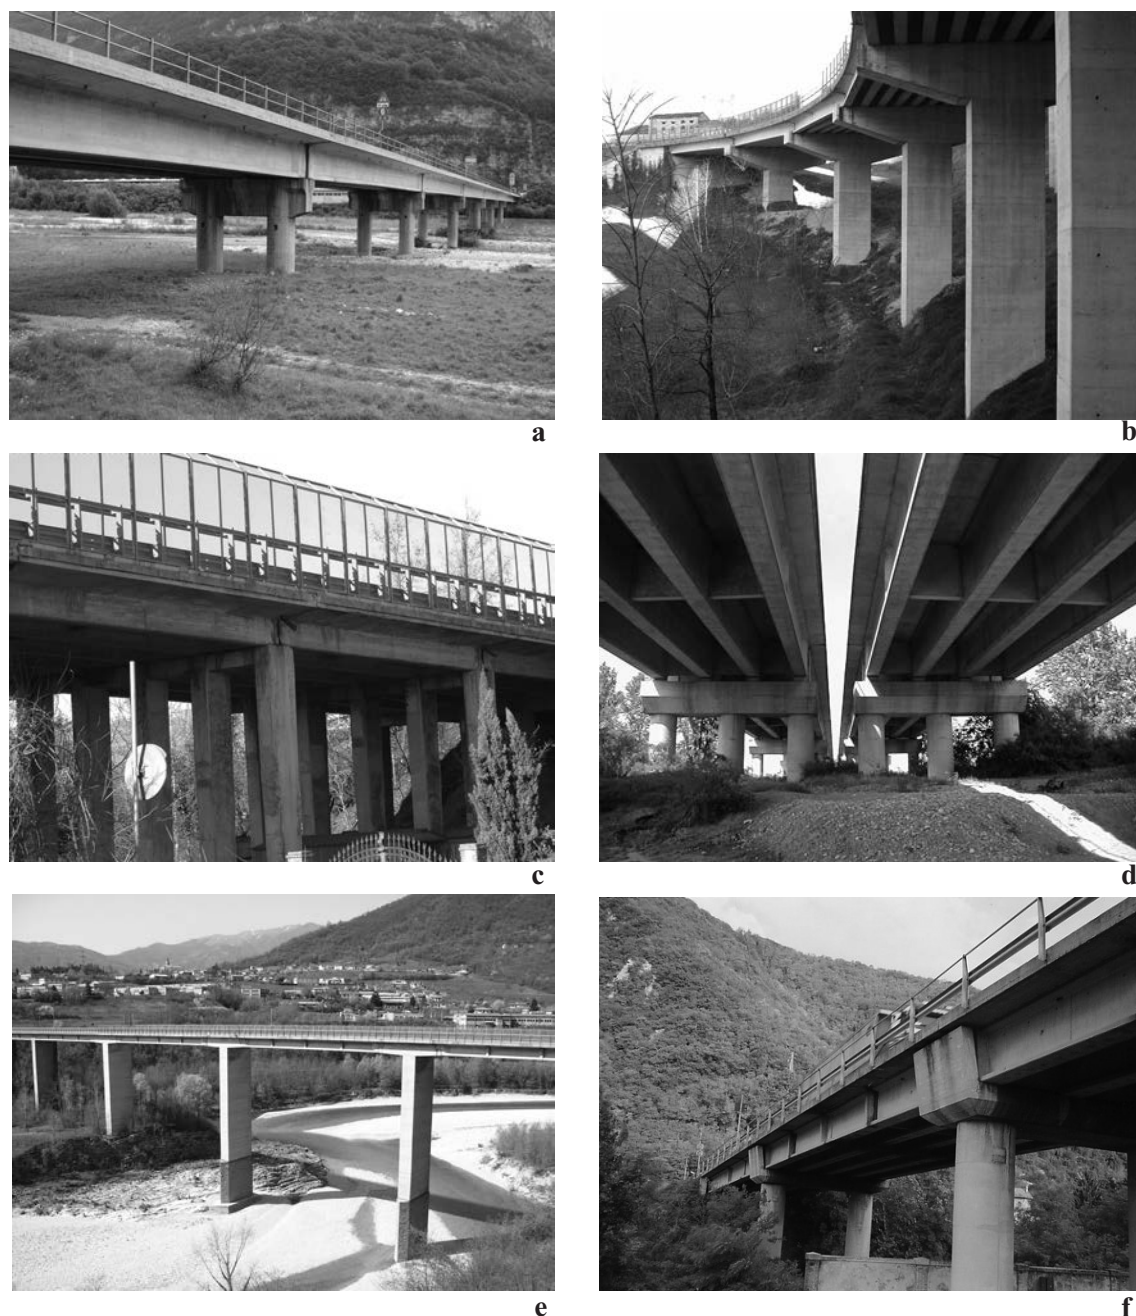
View of the six bridges: a) Campelli bridge; b) Botteon viaduct; c) San Vendemiano bridge; d) Spresiano highway bridge; e) Quero bridge; f) Fener bridge.
